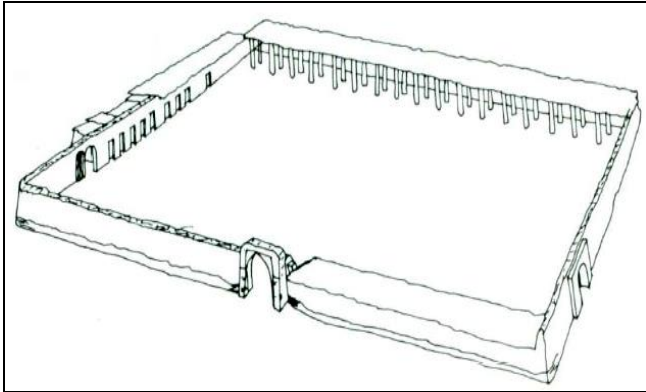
Earlier Plan of Prophet's Mosque (Source- Hillenbrand)
